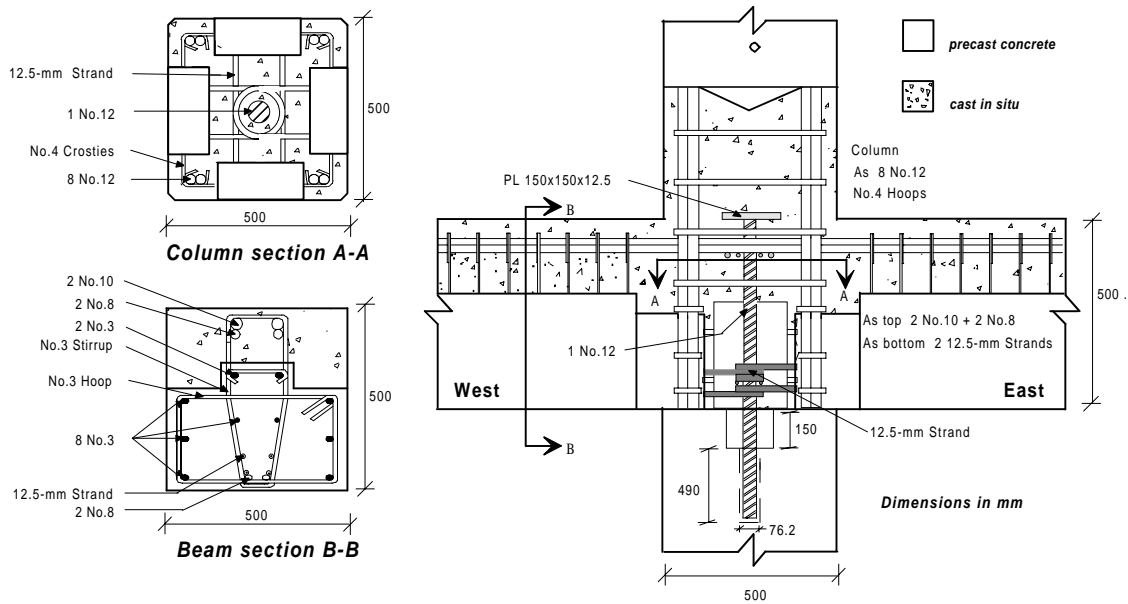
Joint Reinforcement of Specimen J2, EW Direction
